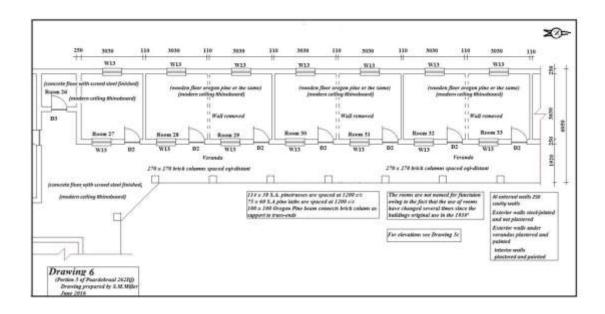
Above. Layout of rooms 27 to 33 in Drawing 6. (Drawing S.M. Miller 2016.)
